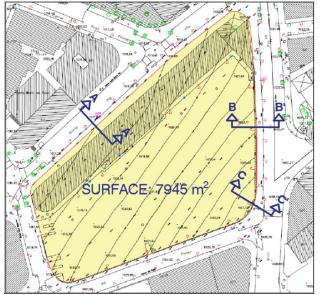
Perimeter of the excavation and location of the typical cross-sections.
